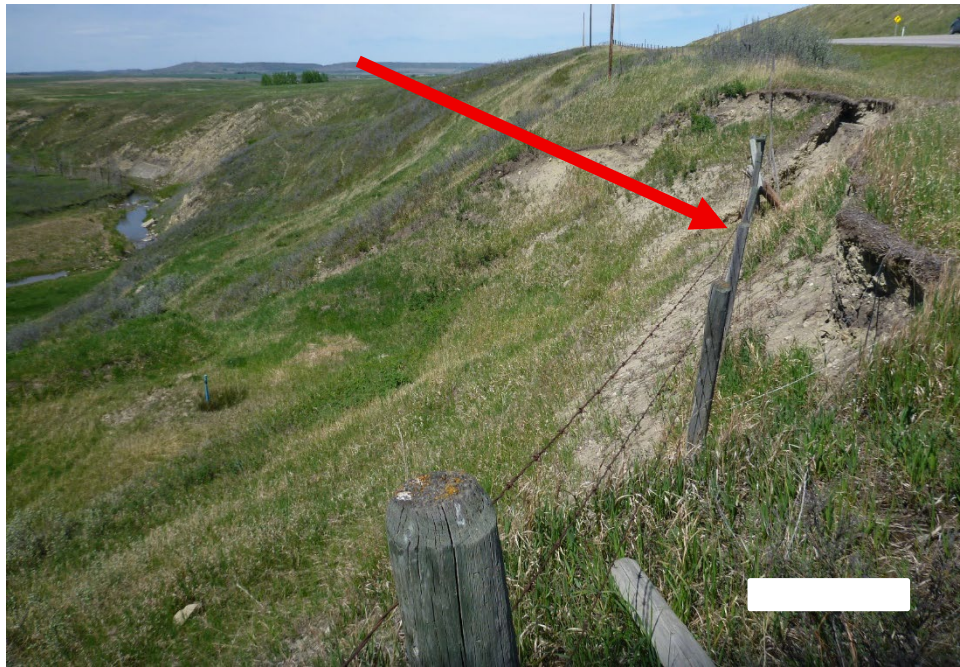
The ditch is well vegetated along Site A. The erosion of the head scarp near the north extent of the site is retrogressing towards the ditch/highway surface. Photo taken May 27, 2025, facing north.
